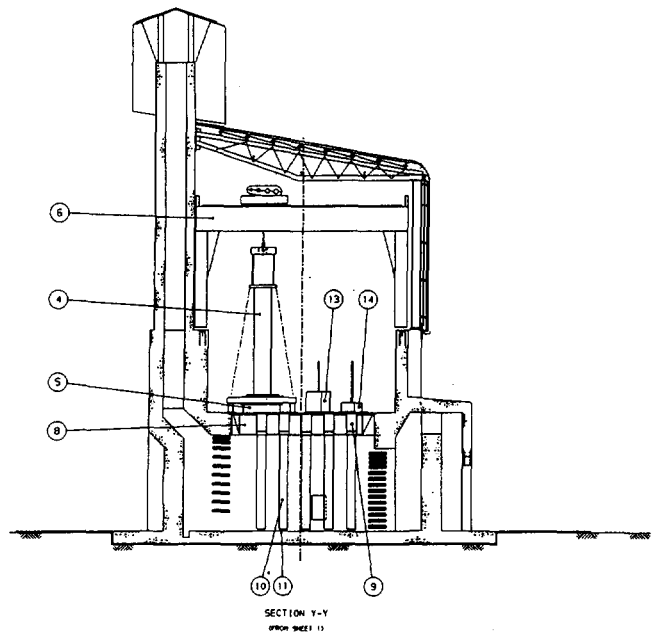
End of Fort St. Vrain storage vault: (4) Container handling machine; (5) Isolation valve; (6) Crane; (8) Charge face structure; (9) Shield plug; (10) Fuel storage container; (11) Container support; (13) Shield plug handling device; (14) Uranium shield handling device
